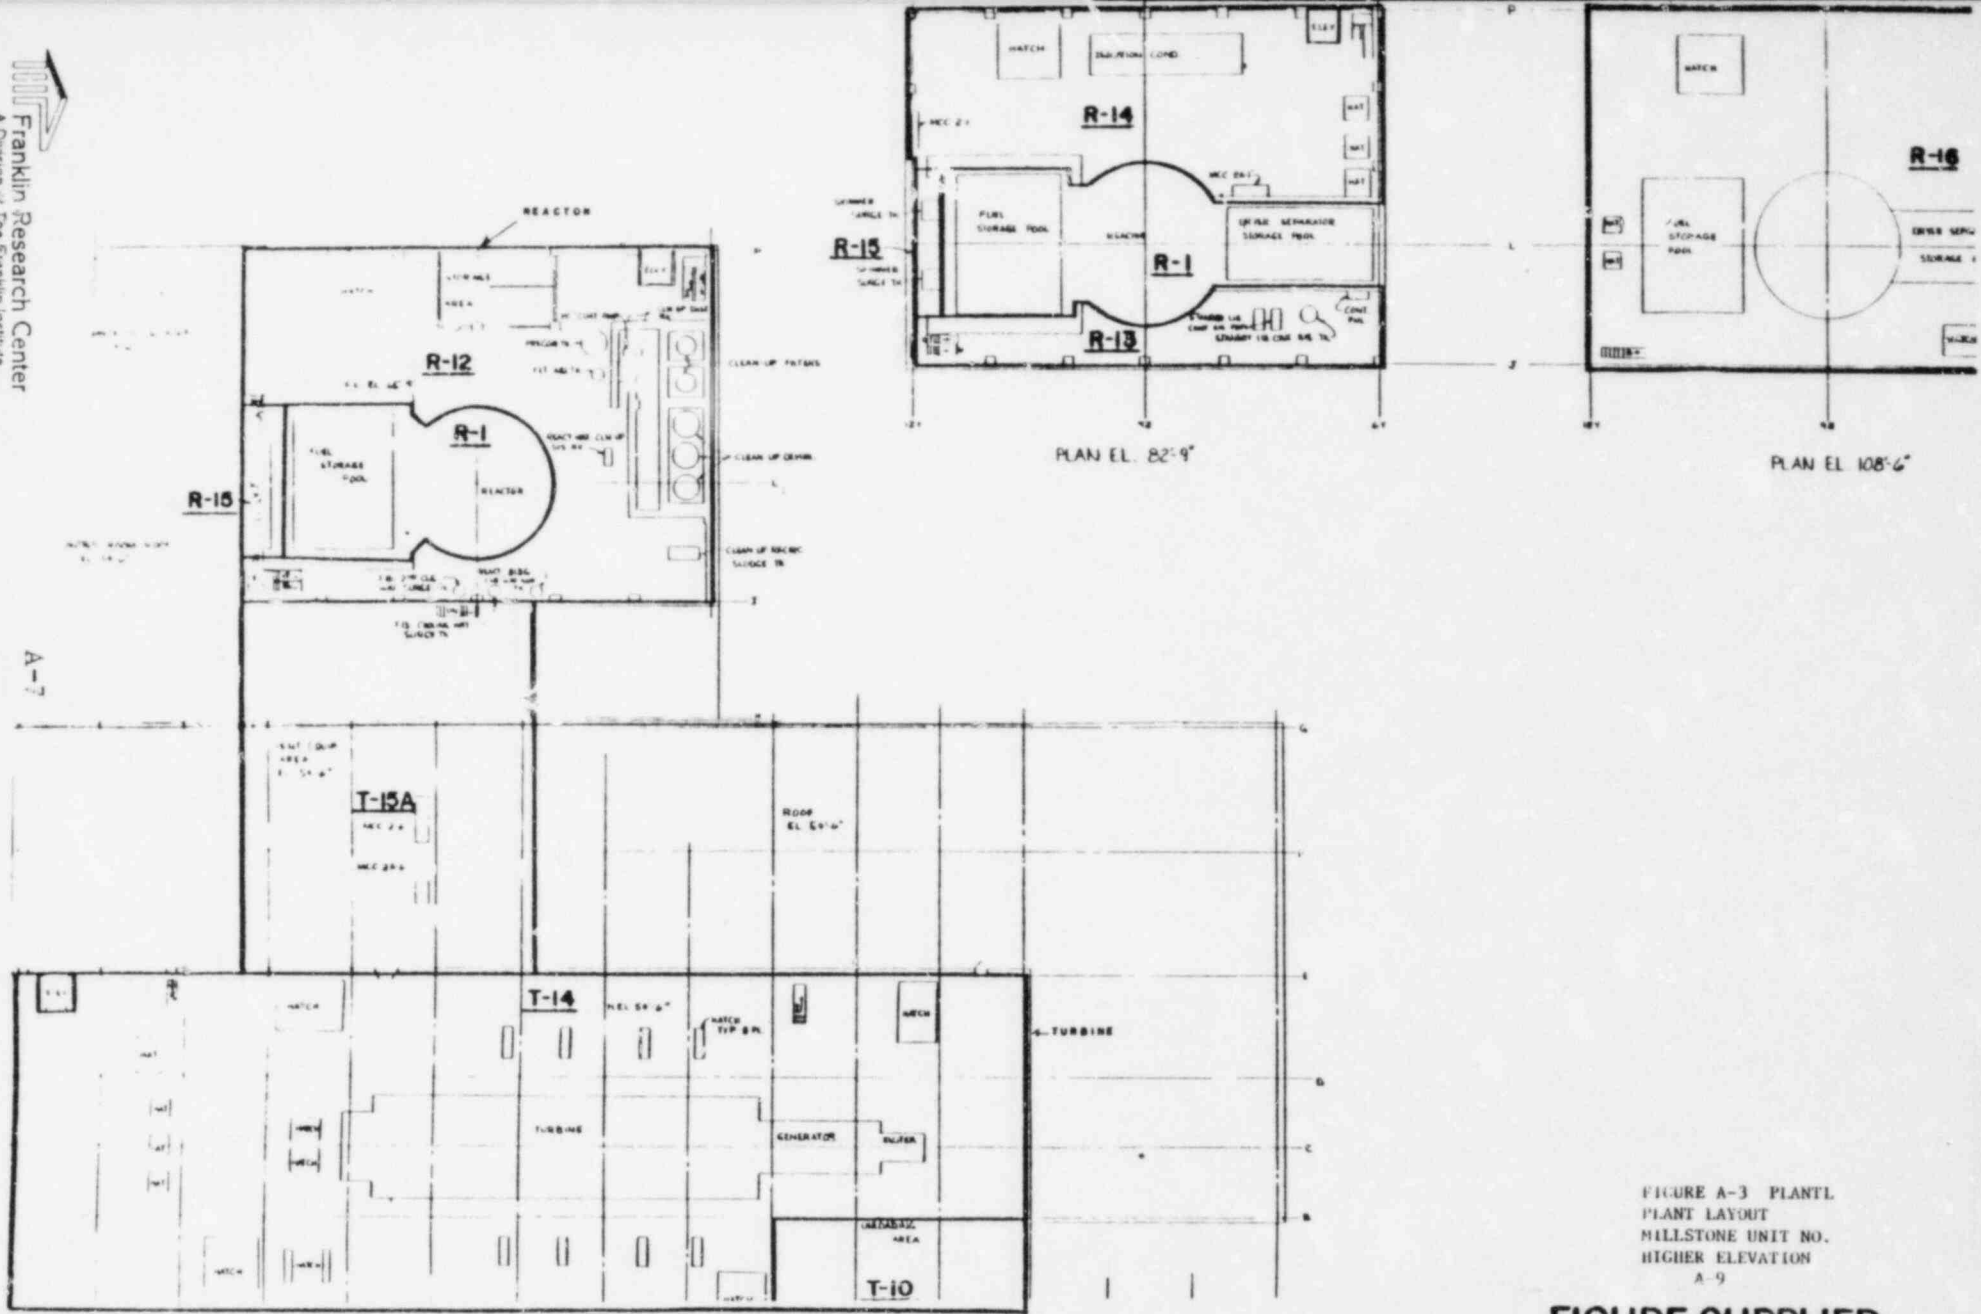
Millstone Point Unit 1 Plant Layout, Higher Elevation [FSAR]
